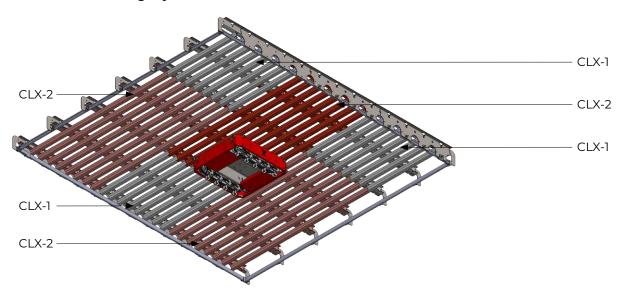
Ceiling area of 3x3 meters consisting of six CeiliX elements – three CLX-2 elements and three CLX-1 elements.
